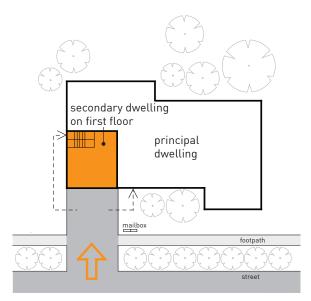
F.2-5: Attached secondary dwelling incorporated within the principal dwelling on first floor.
